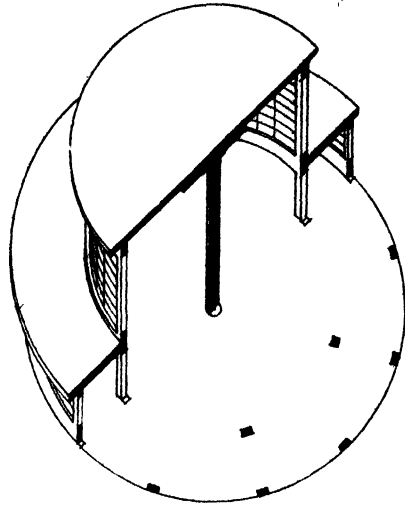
STRUCTURE IN REINFORCED CONCRETE
